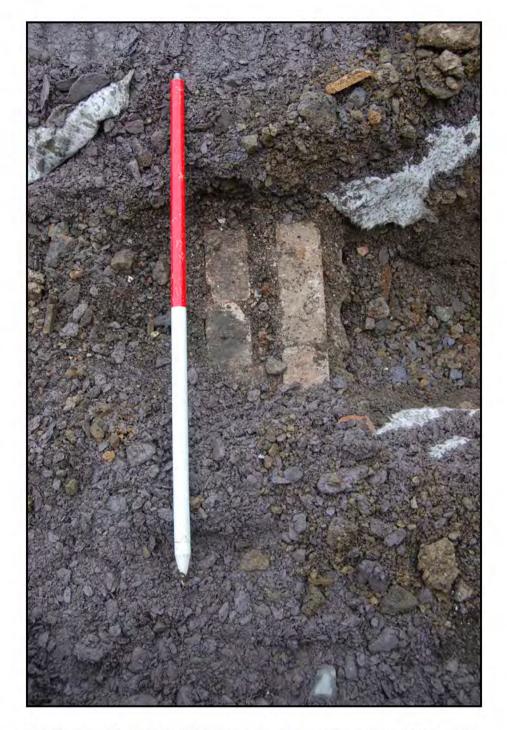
Zone 2/Yard 2 (PRN 30454): service trench excavation - detail of Building 02 foundation level (Ranging pole: 1.0m).
